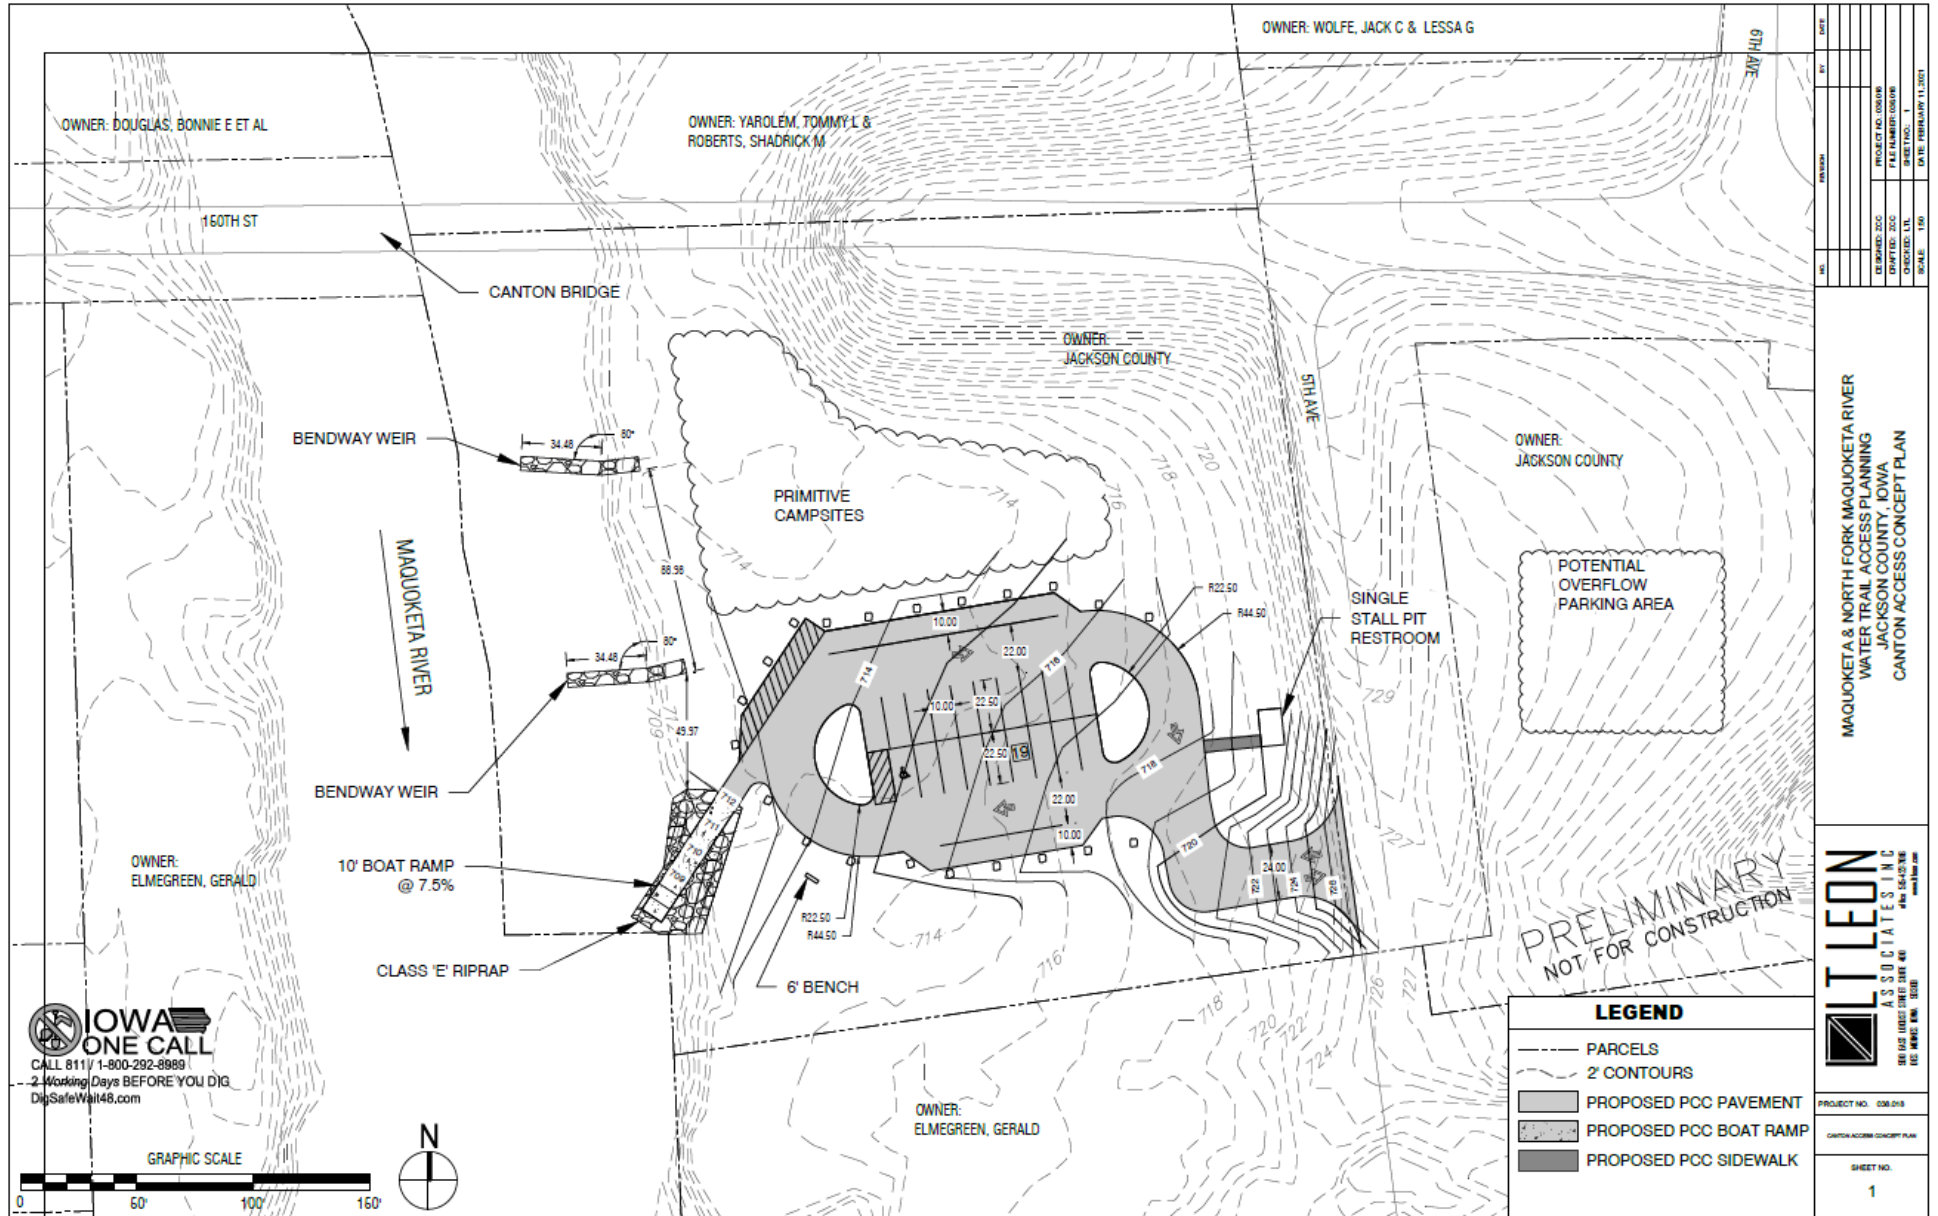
CANTON ACCESS CONCEPT PLAN
